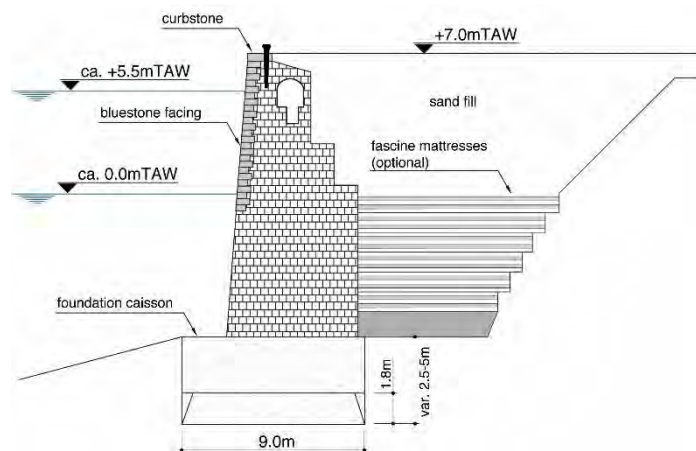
Standard section of the masonry quay walls on top of the foundation caissons, filled with concrete
